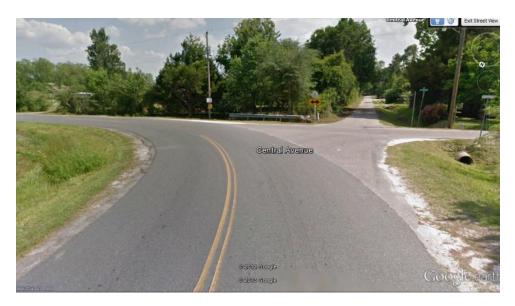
Southbound view of guardrail and exposed culvert end at NE 228th PL/NE 125th Way
